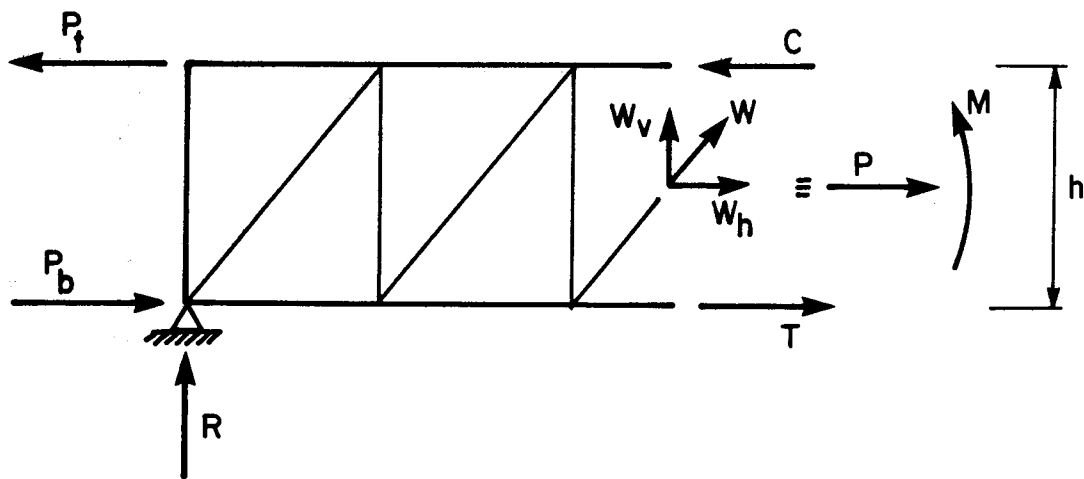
Forces at a Mid-Panel Section.
